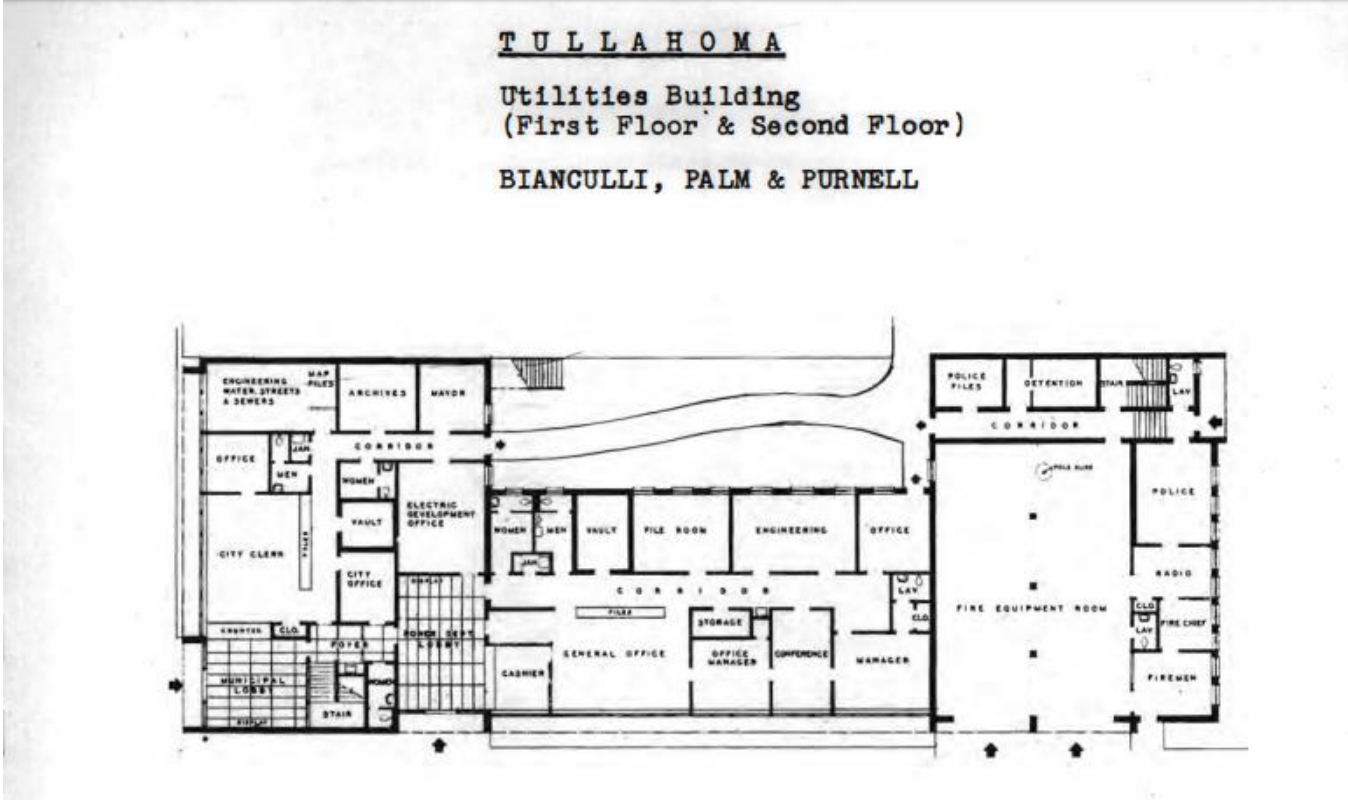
Original First floor plan of the Tullahoma Municipal and Utilities Building. Photo Source: Hobday, Victor C. “Documents Relating to Joint Electric System Municipal Buildings.” (1953) *MTAS Publications: Full Publications*. Accessed January 23, 2018. http://trace.tennessee.edu/utk_mtaspubs/4/. 111.
